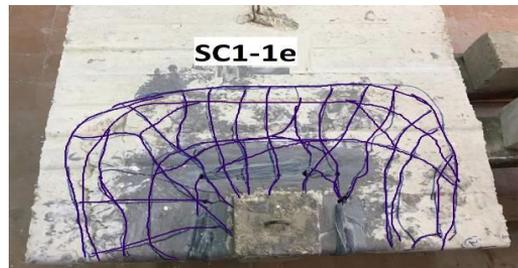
Pattern of cracking for specimen (SC1-1e).
